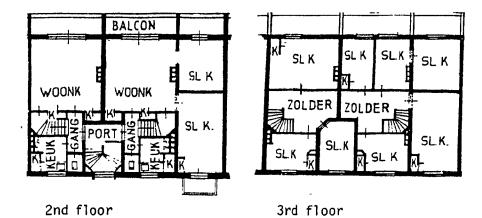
Plans of a typical dwelling unit of two storeys (maisonette). (Grinberg, 1977)
